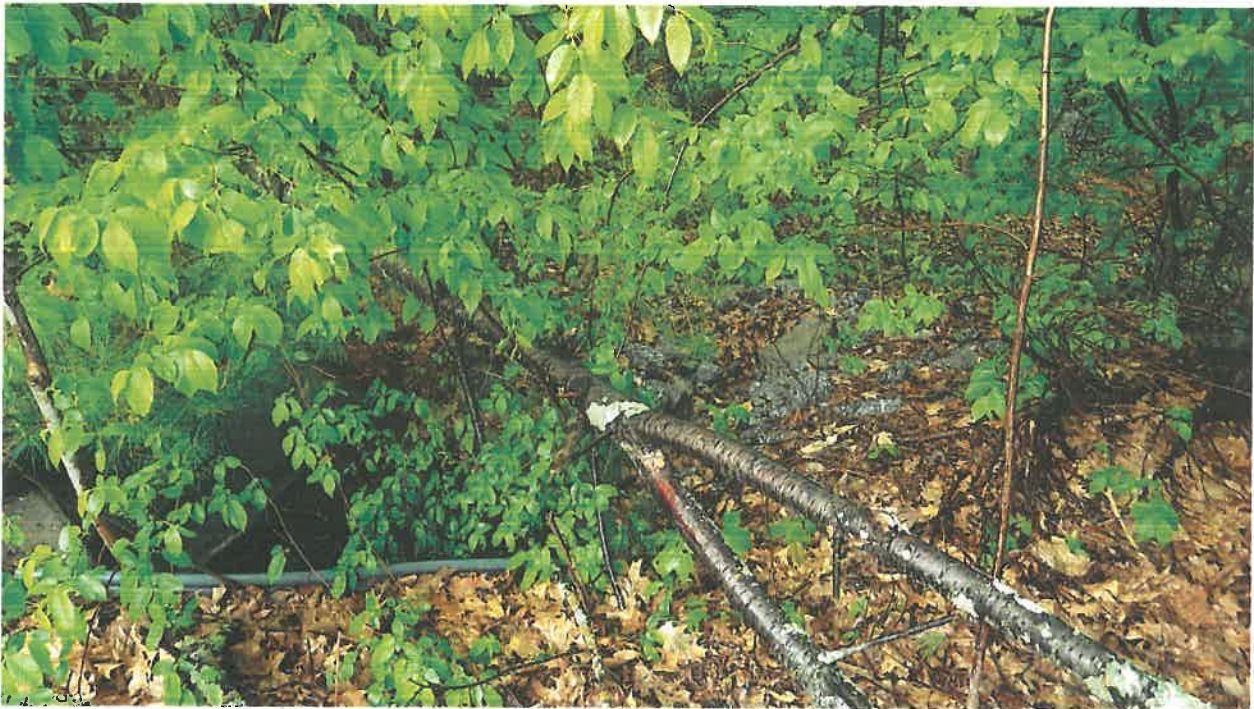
Impact Area BS at Sta. 1069+25 NB, looking at the outlet of a 24" RCP which conveys stormwater runoff under I89 SB and NB and outlets as an intermittent stream (Sheet 19)
